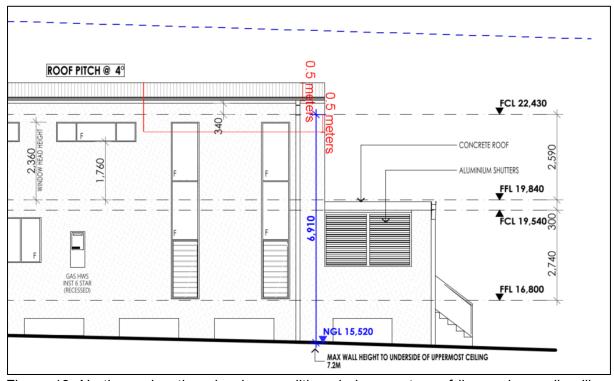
Northern elevation showing conditioned changes to roof line and overall ceiling height above void
